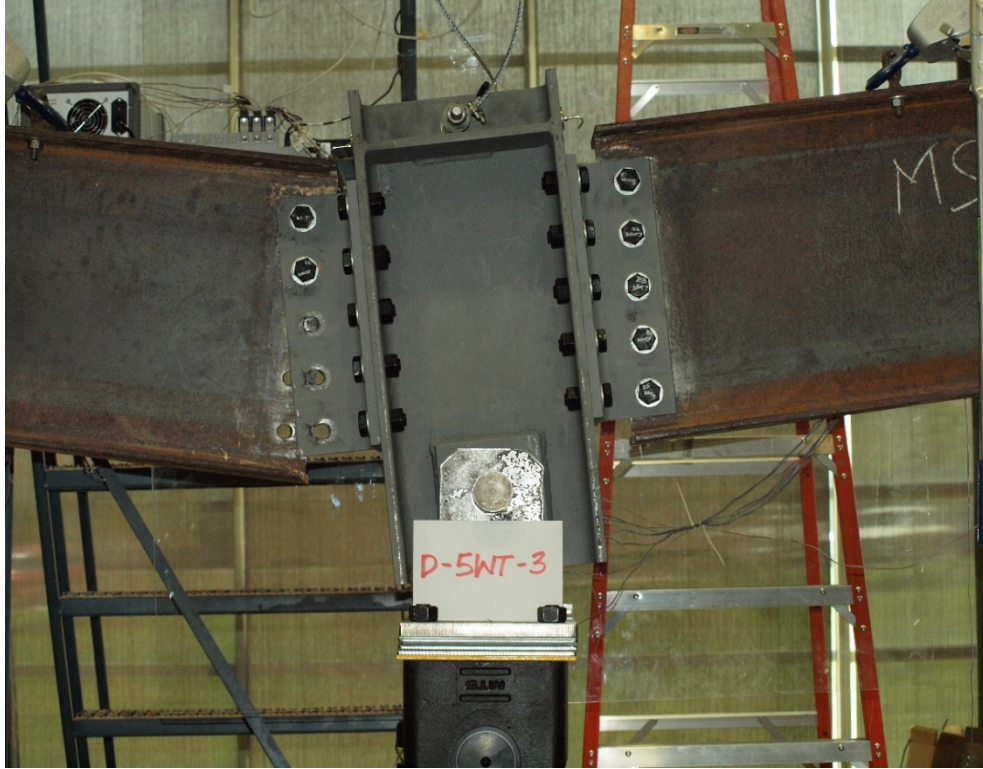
Test Specimen D5WT3 after Testing.
